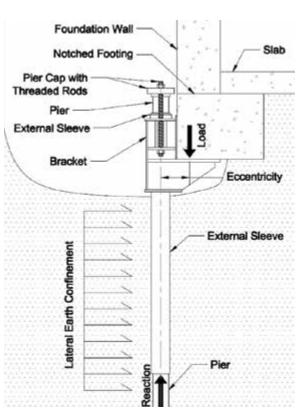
a External sleeve and pier bear against confining soil when system is under load
